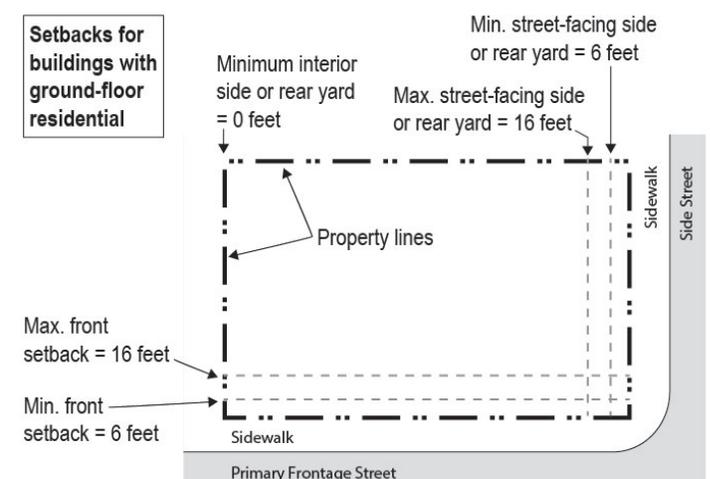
RC-MU Setbacks - with ground-floor residential
